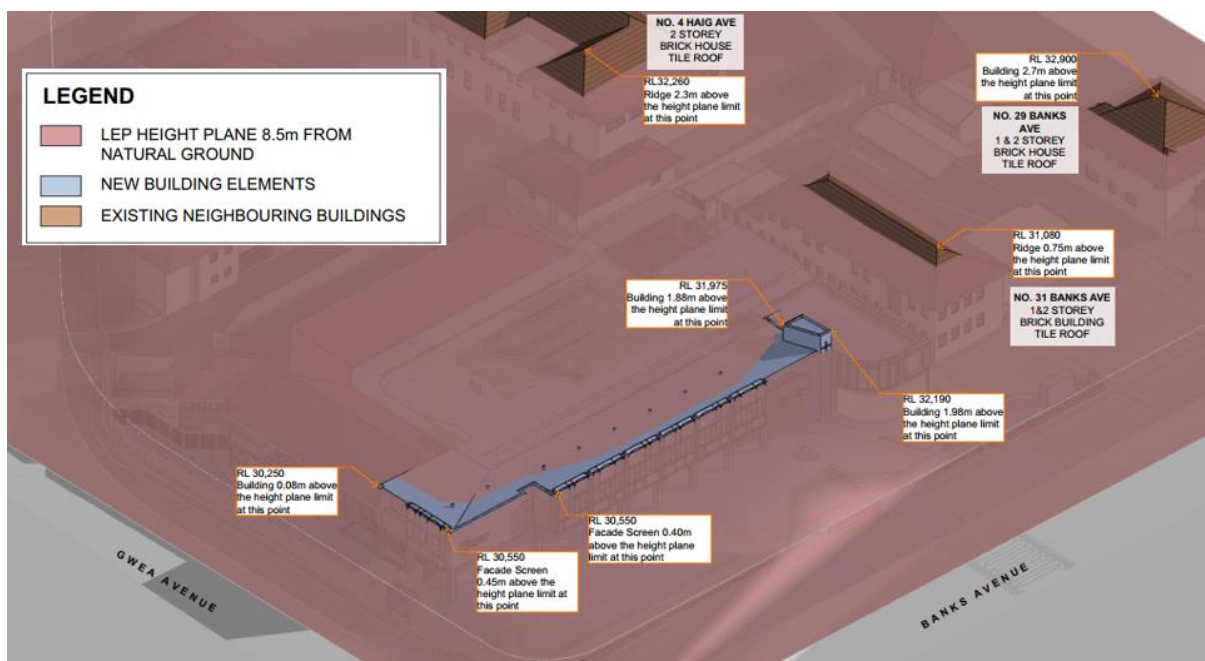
3D Height Plane which illustrates how the neighbouring buildings at 4 Haig Avenue and 29 Banks Avenue and the existing buildings on the subject site exceed the 8.5m building height limit provided by BLEP 2021.
